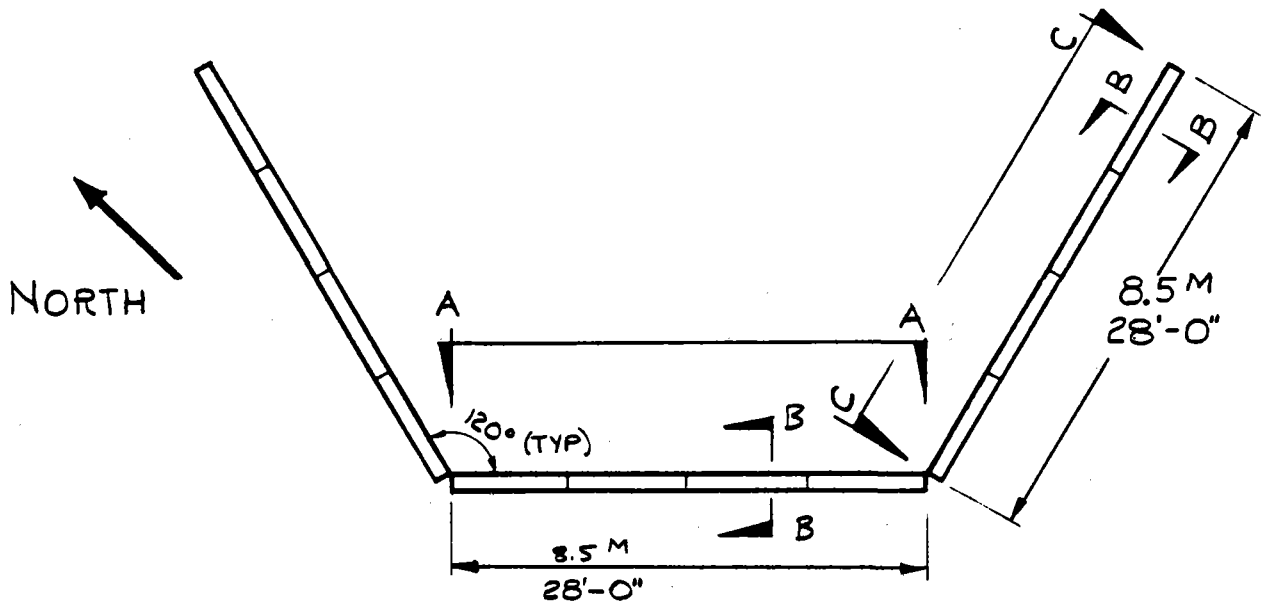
Plan - Receiver Panels, East Cavity
